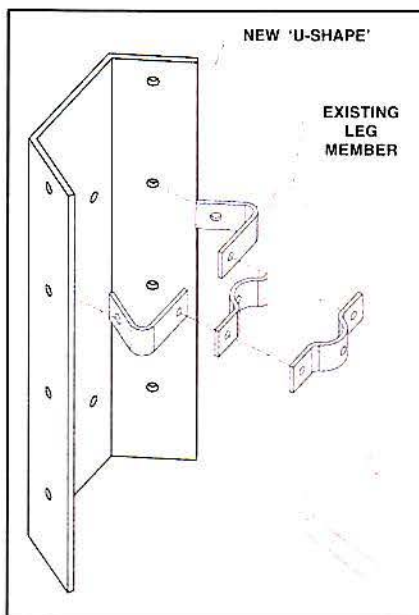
The 'U-shape' with the formed leg member around the existing leg member constructs 'a tower around a tower.'
